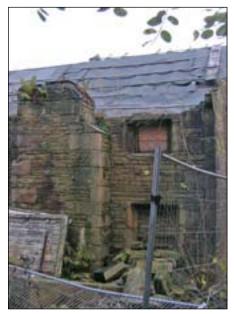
west wing, west wall, showing quoined masonry and external stack (© English Heritage)
